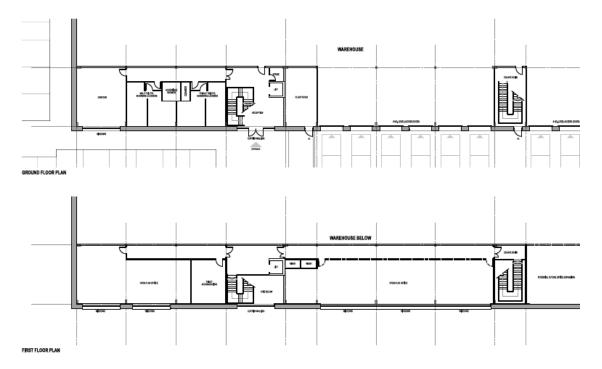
Proposed Ancillary Aspects Ground and First Floor Plan
